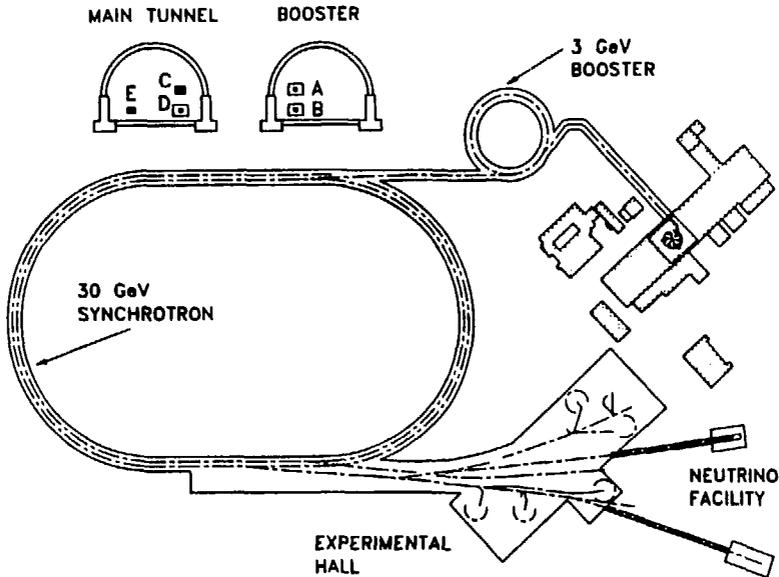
Proposed site layout for the TRIUMF KAON Factory.
